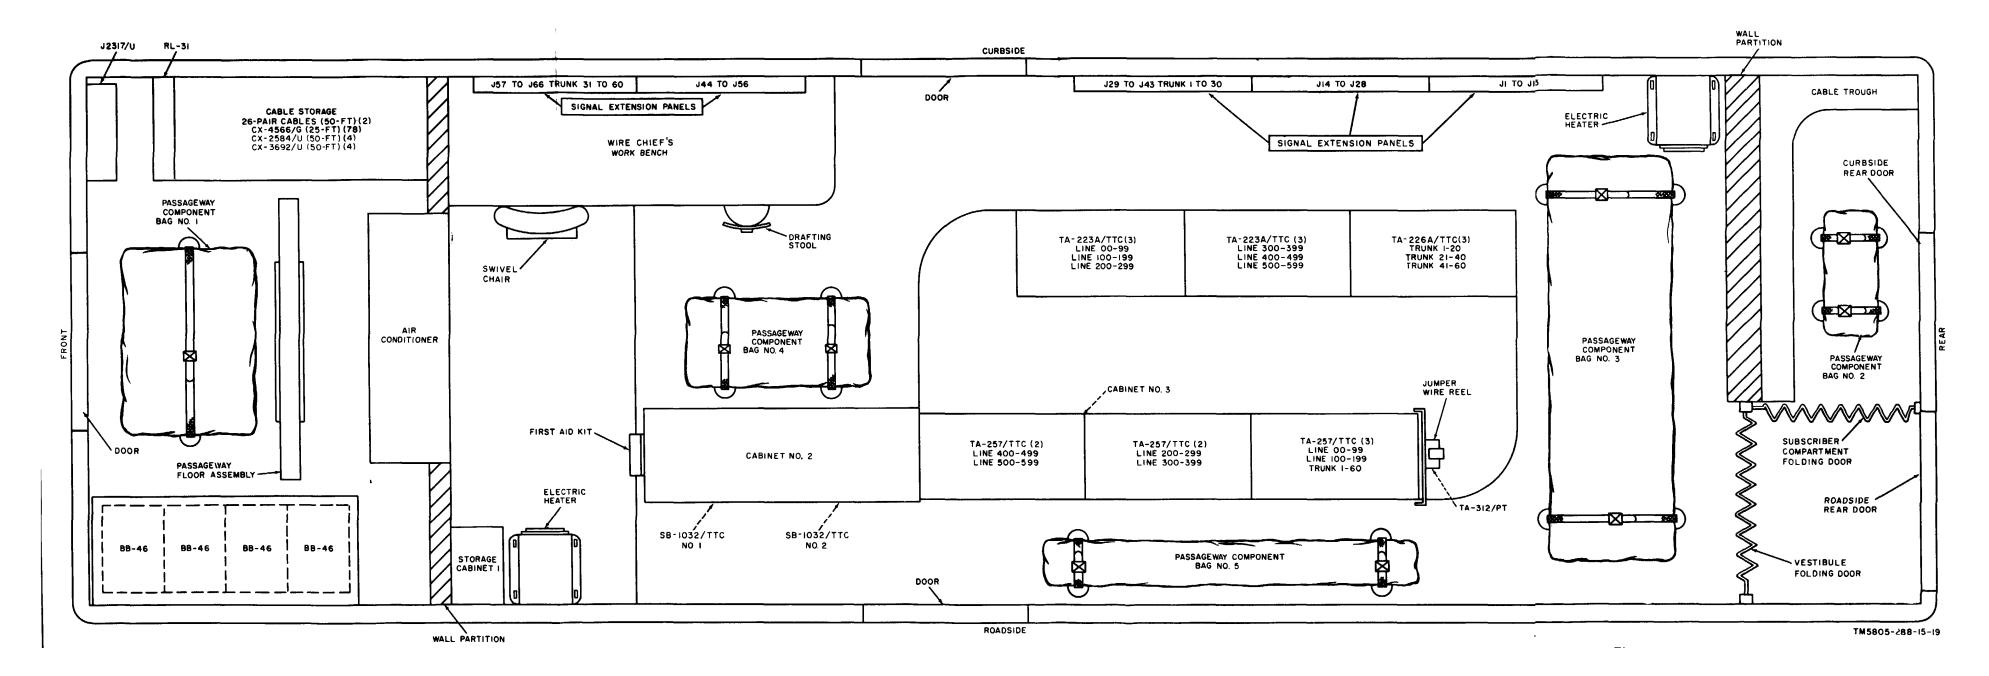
Telephone Terminal Group AN/MTA-5, floor plan.
